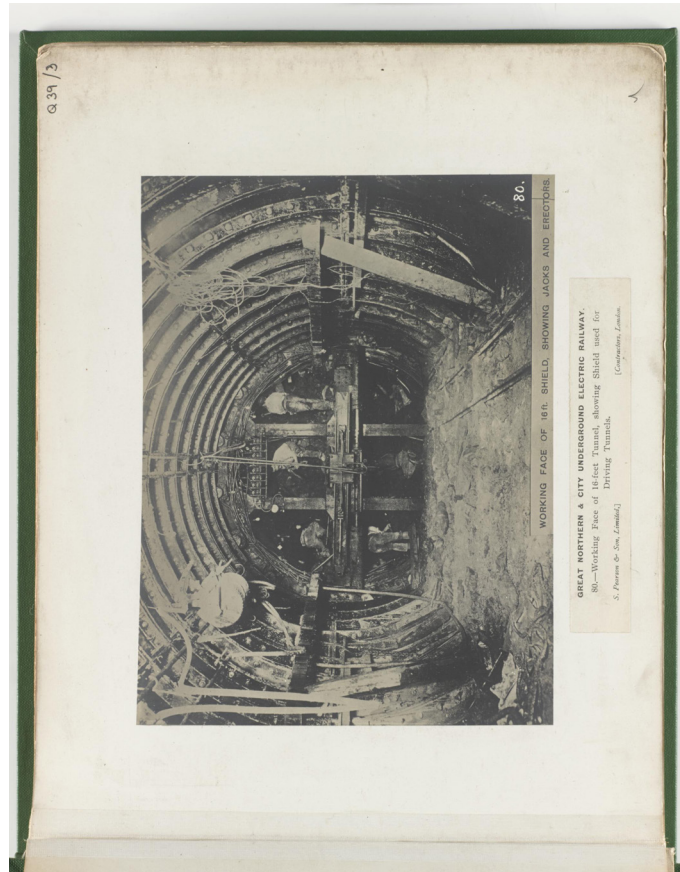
Unknown author, “Working face of 16-foot tunnel, showing shield used for driving tunnels”
